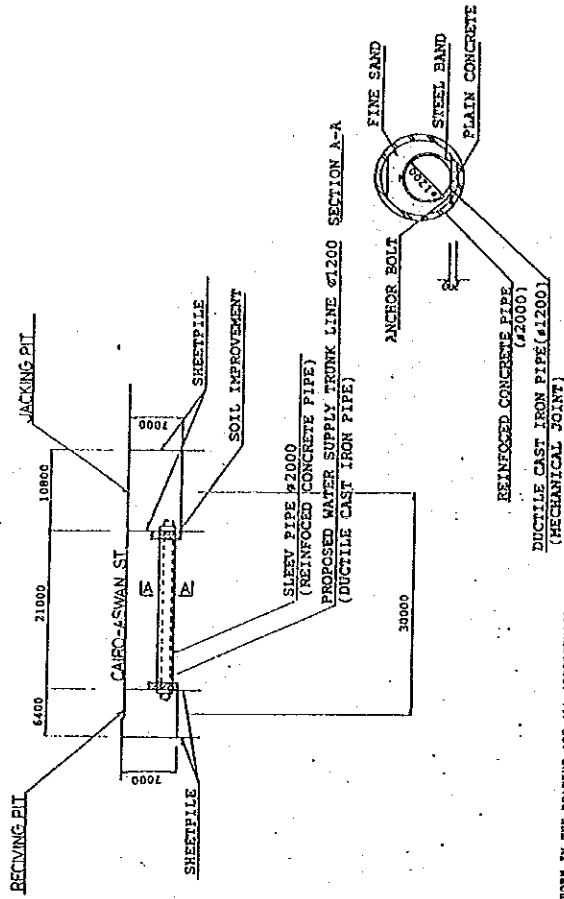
LONGITUDINAL SECTION AT ROAD CROSSING S=1:500
